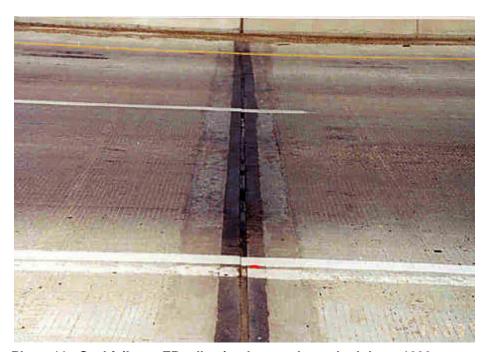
Seal failure - EB adhesion loss and punched down 1999.
